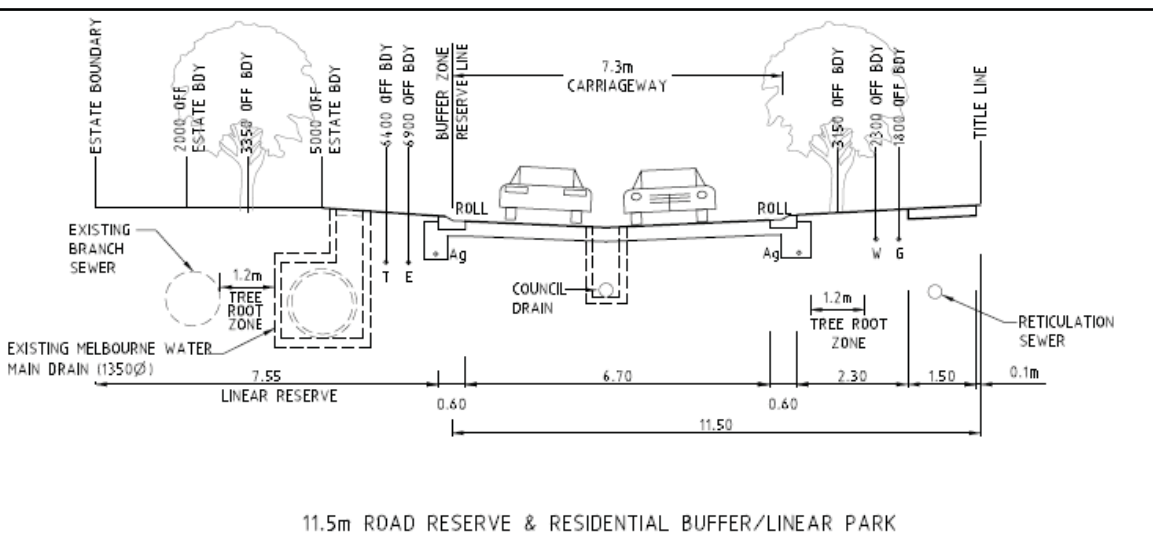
Local Access Road Cross Section Adjacent Linear Park (11.5 metre)
